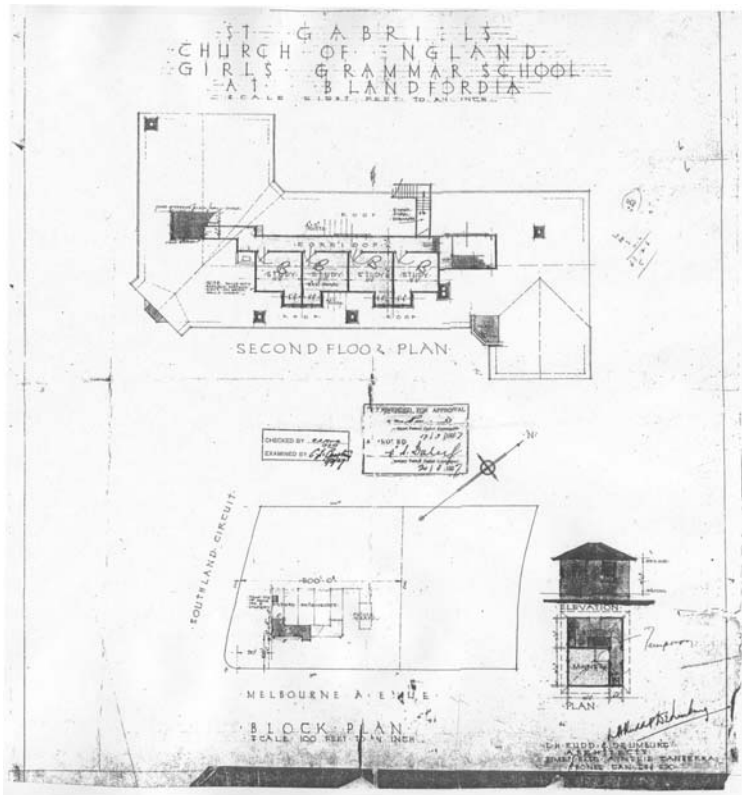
Site Plan (EMA 2004) ----- CEGGS Boarding House Precinct
